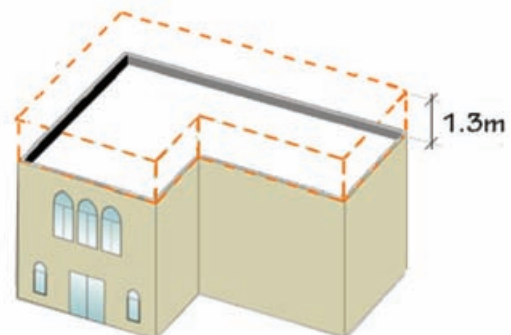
Typical House 2 Virtual RWH Roof Reservoir
